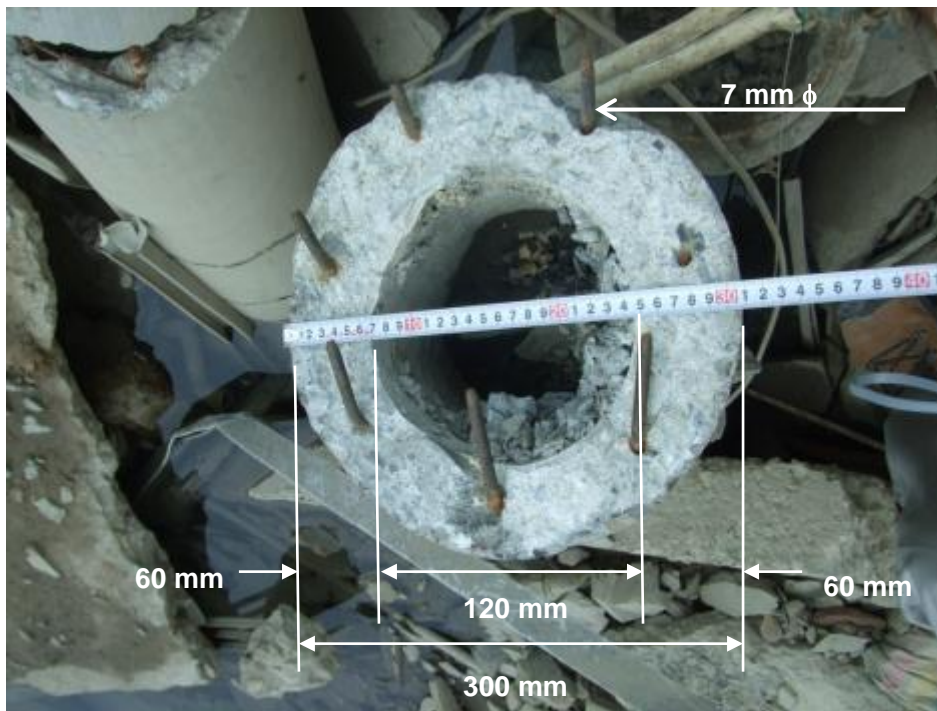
Fracture surface of PC pile for Building #1: A fracture cross-section of PC (Pretension type centrifugal pre-stressed concrete) pile used for Building #1, 300mm and 120mm in outer and inner diameters respectively, has 7 PC wires exposed with cut ends thinning to about 4mm diameter.
